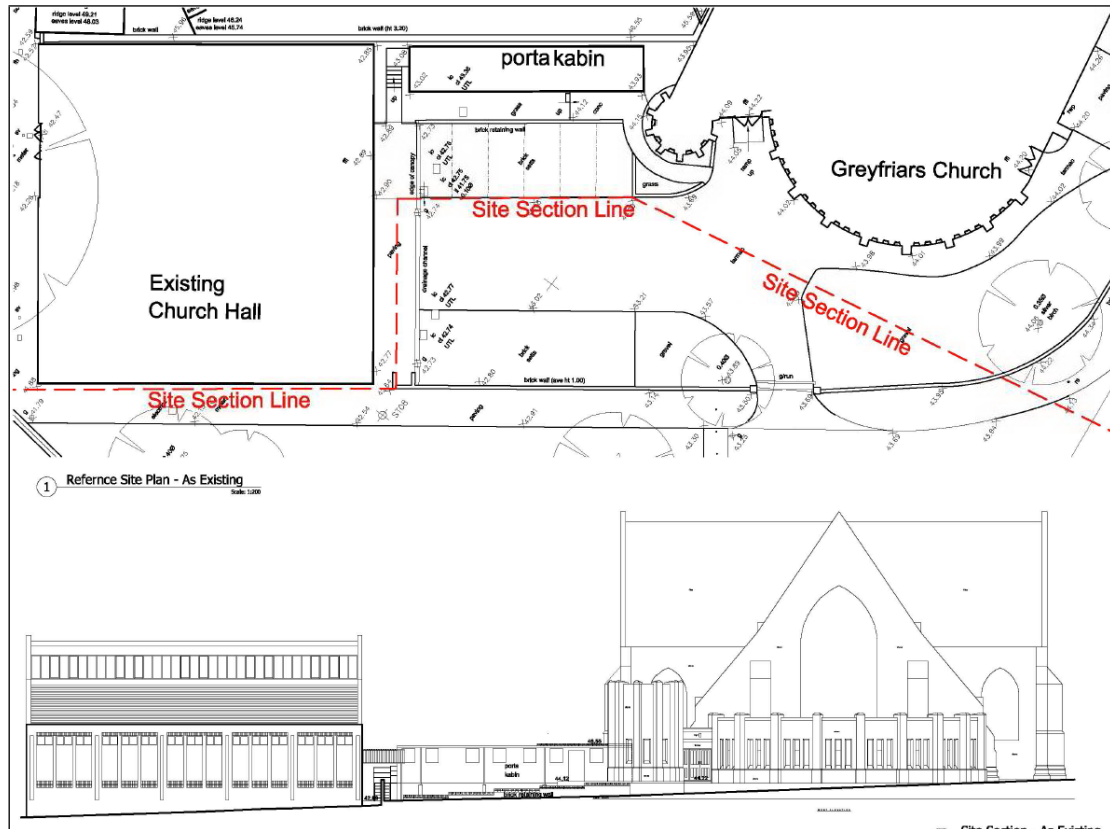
Existing section (Greyfriars Church, Church Hall, and portacabins)
